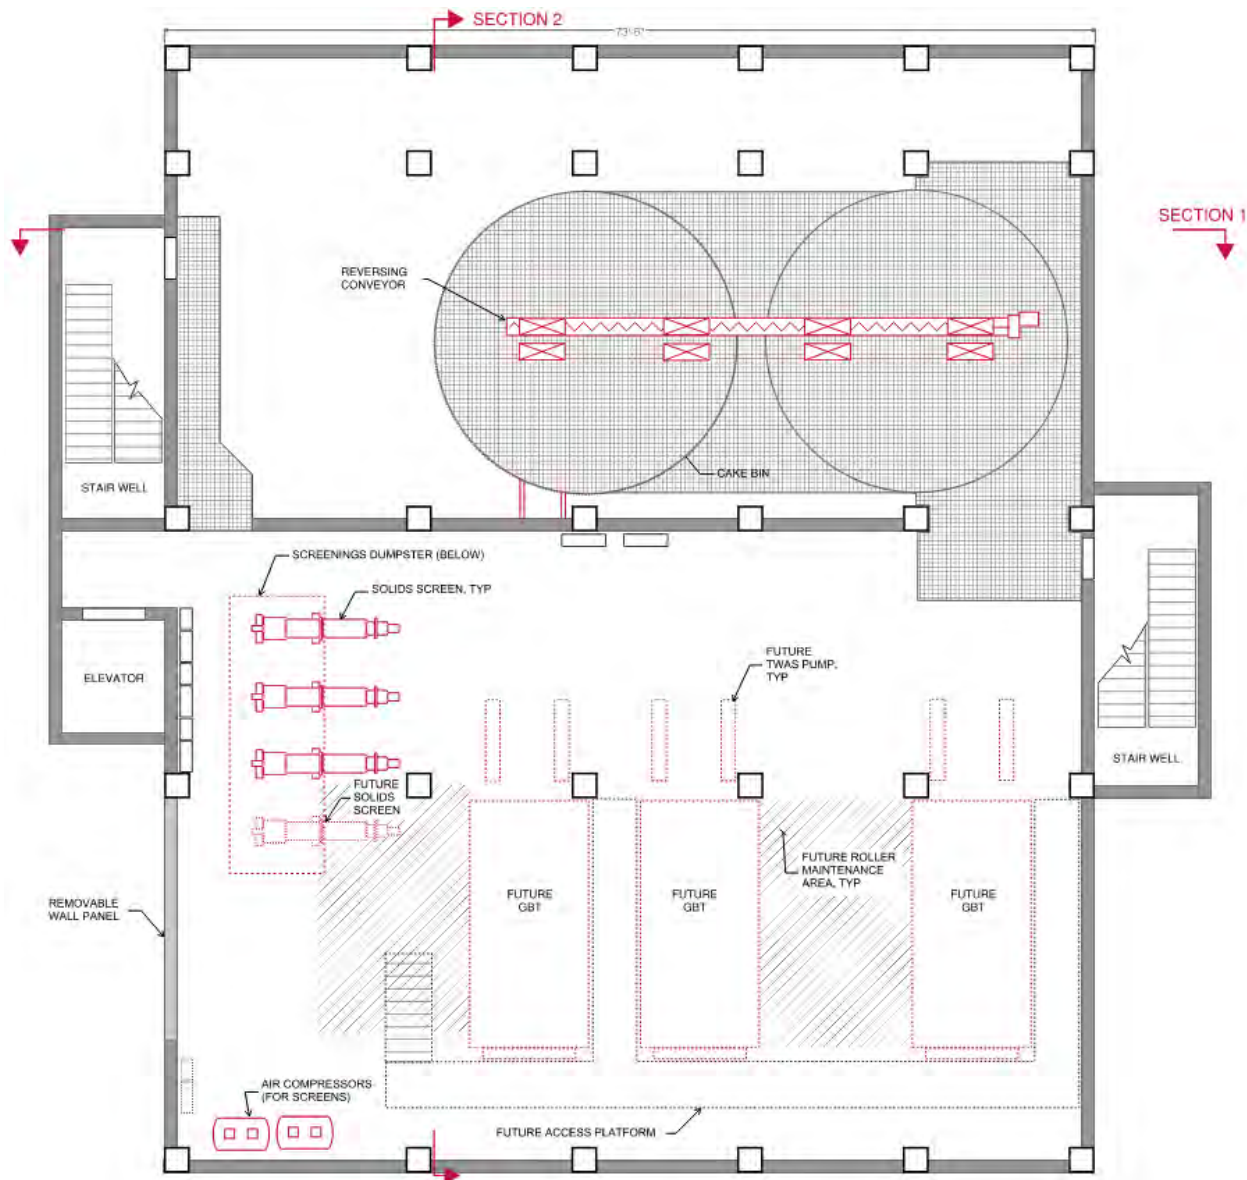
New Thickening/Screening/Dewatering Facility Mezzanine Floor Plan
